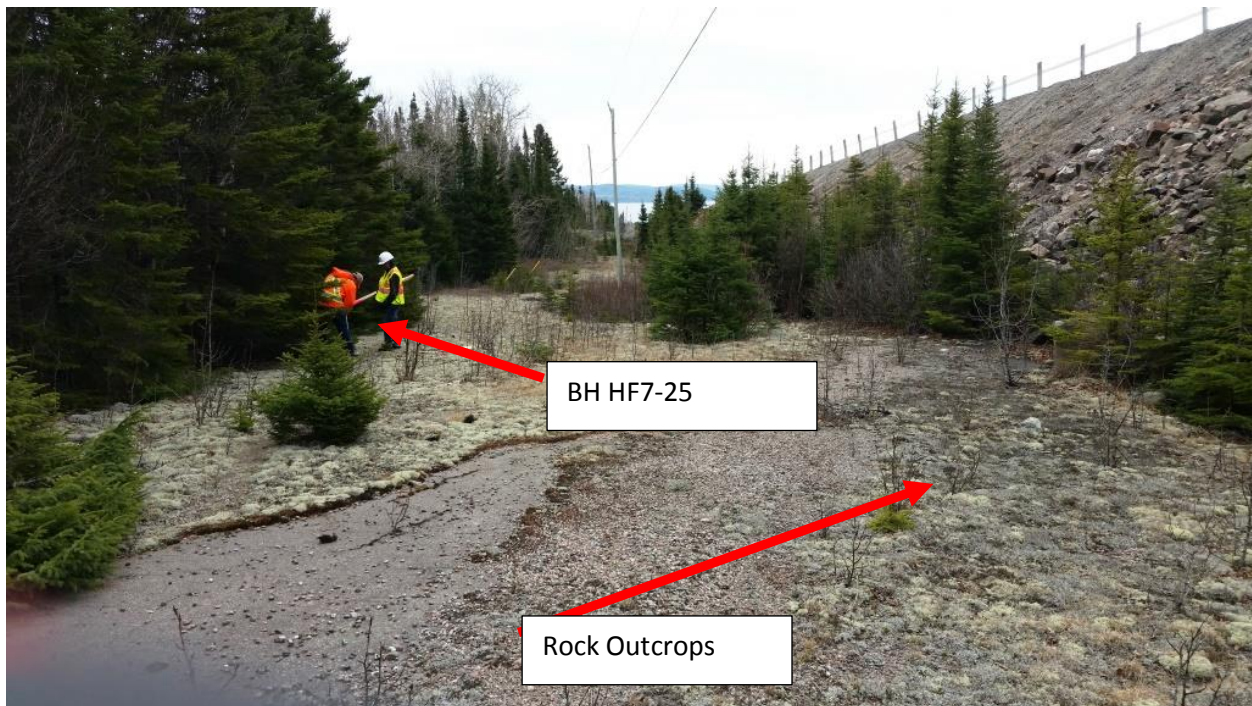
Looking toward east - Rock Outcrops and BH HF7-25 (April 2017)
